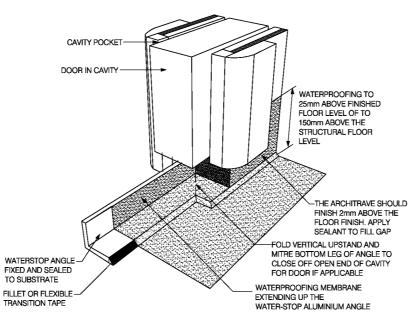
(B) WATERPROOFING ATDOOR OPENING CAVITY SLIDER
